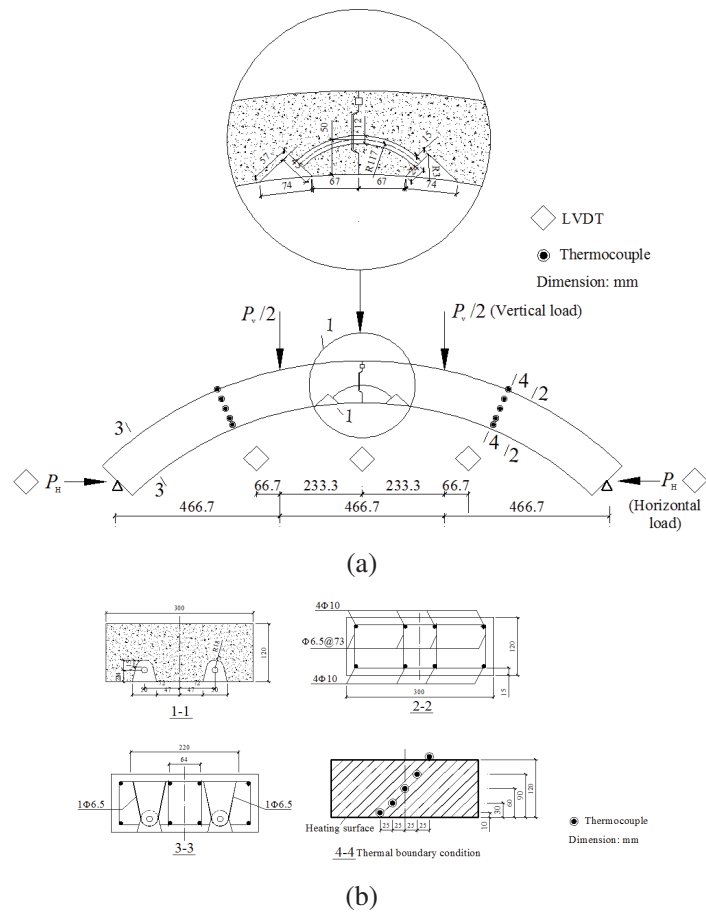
Configuration of joint assembly, reinforcement arrangement for the RC lining segmental joints, and instrumentation:(a) joint layout; (b) profiles
